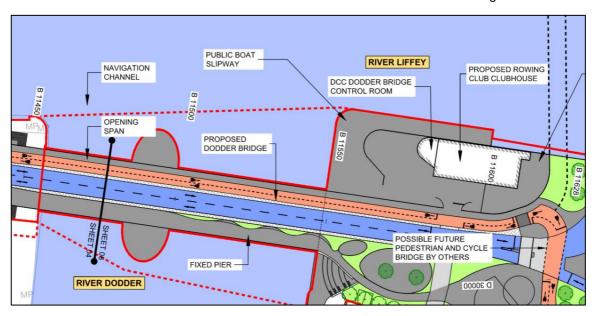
Plan of the proposed River Dodder Public Transport Opening Bridge
